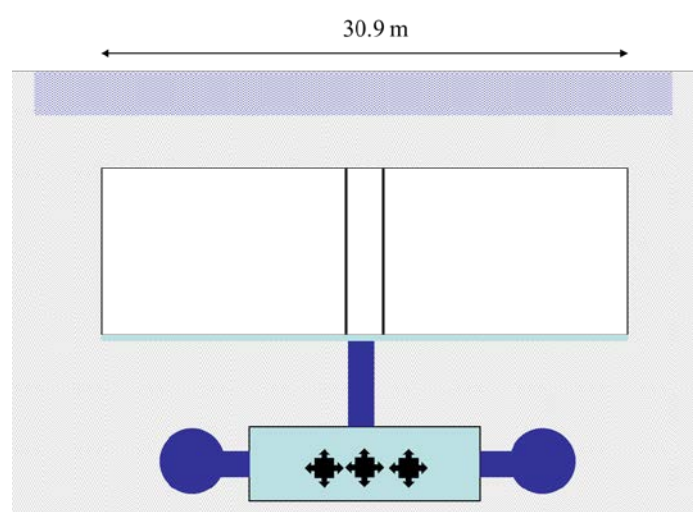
Assumed cross section of a tunnel. Drainage system is assumed to have sufficient capacity to drain the water directly to the pumps. Dimensions are not to scale.
